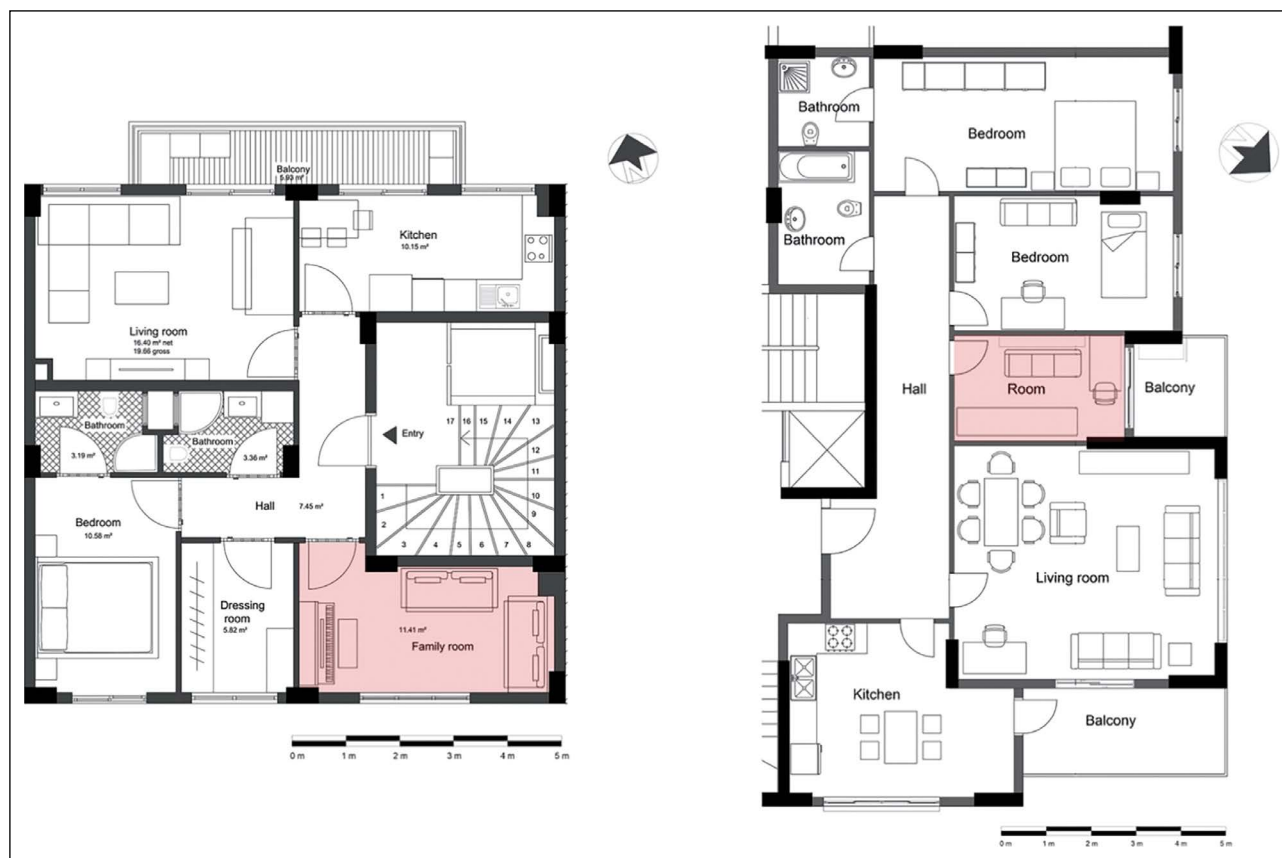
Left: Case 1 floor plans of case buildings and case rooms indicated with red color hatch. Right: Case 2 floor plans of case buildings and case rooms marked with red color hatch.
